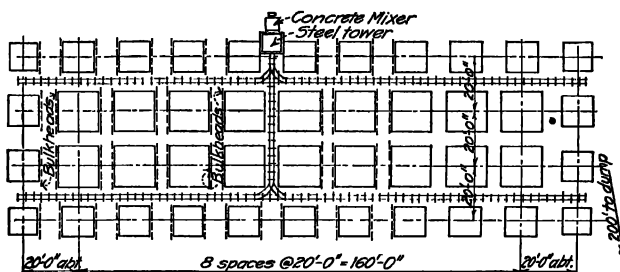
Excavation plan of reinforced concrete industrial building.
